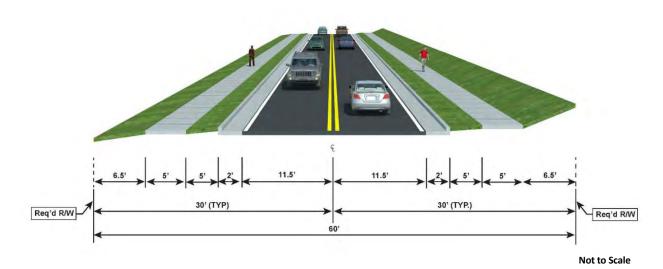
Typical Roadway Section, Urban Local (UL-2): Mancuso Lane Two-Lane Roadway with Sidewalks
